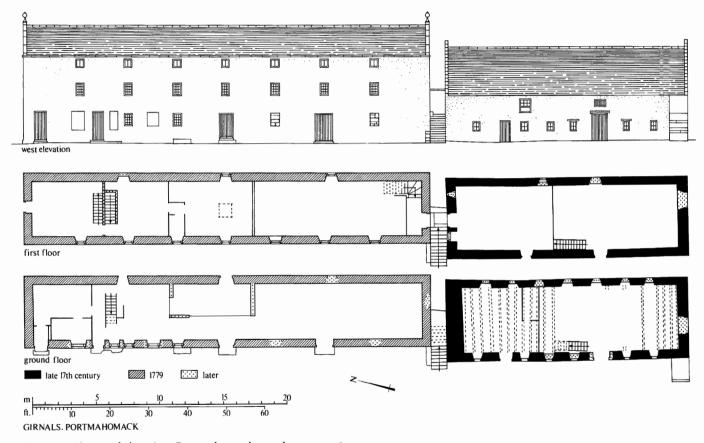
Plans and elevation, Portmahomack storehouses, 1983.
